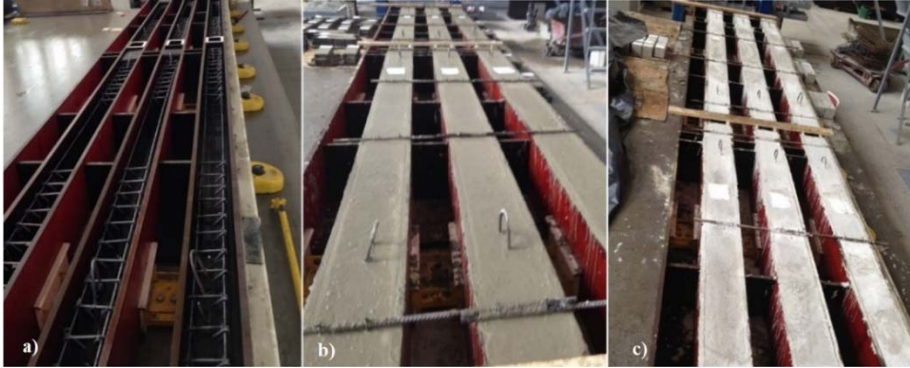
Prestressed beam specimens: a) reinforcement; b) concrete pour; c) curing
